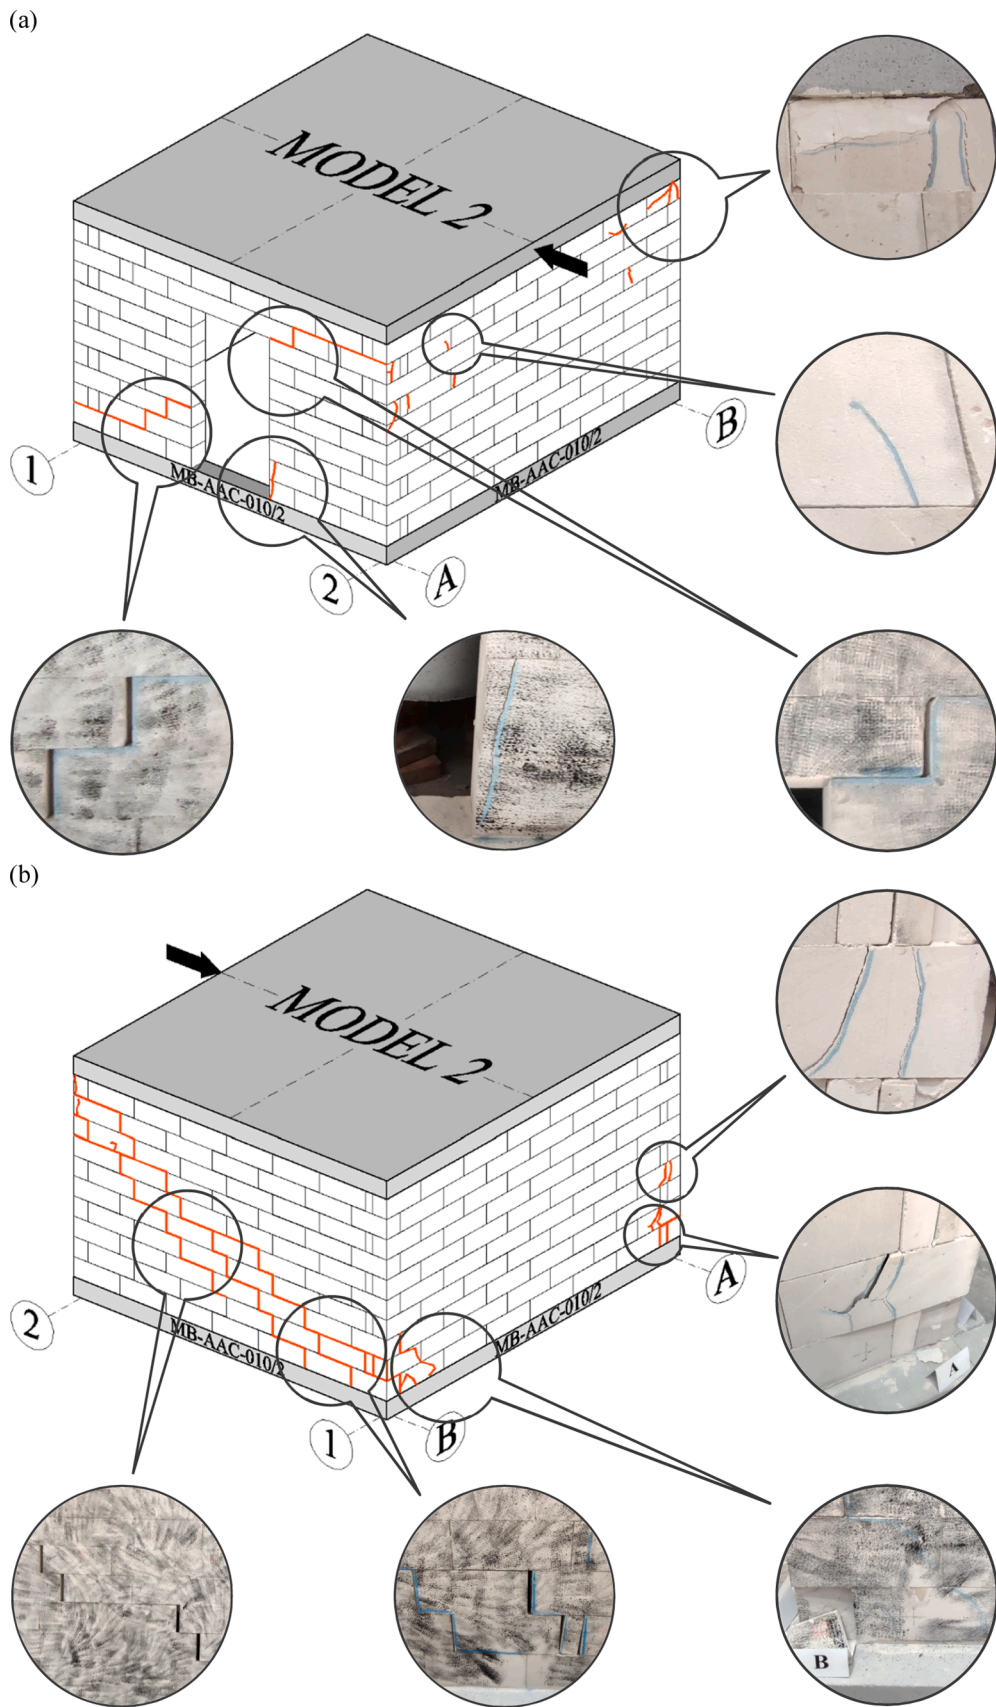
Damage pattern of building model 2: (a) stiffening wall A with a door opening and solid wall 2, (b) solid stiffening wall B and solid wall 1.
